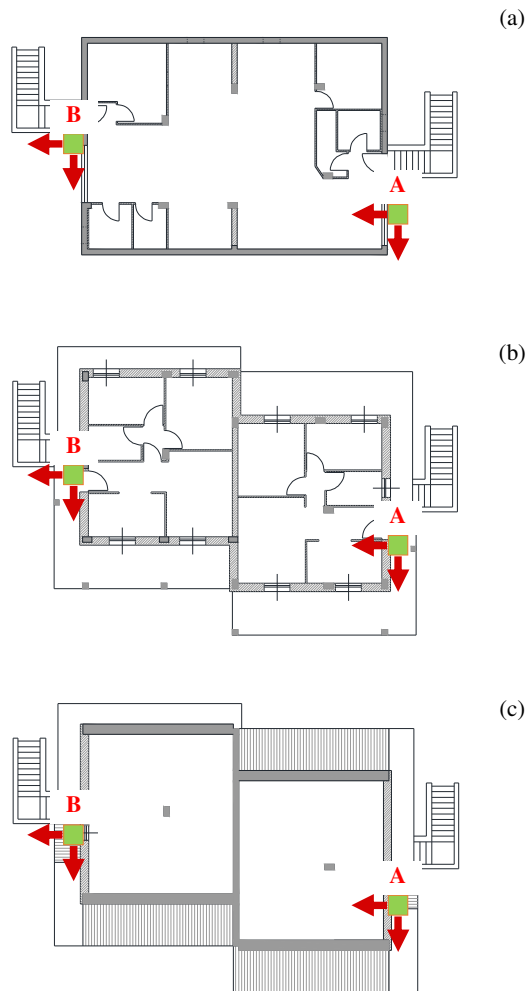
Sensors arrays in Building 2: (a) underground floor, (b) ground floor, (c) attic floor.
